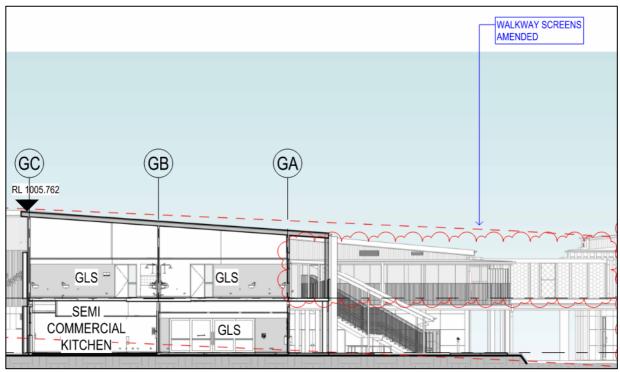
PROPOSED WALKWAY SCREENING BETWEEN BLOCK G & C
